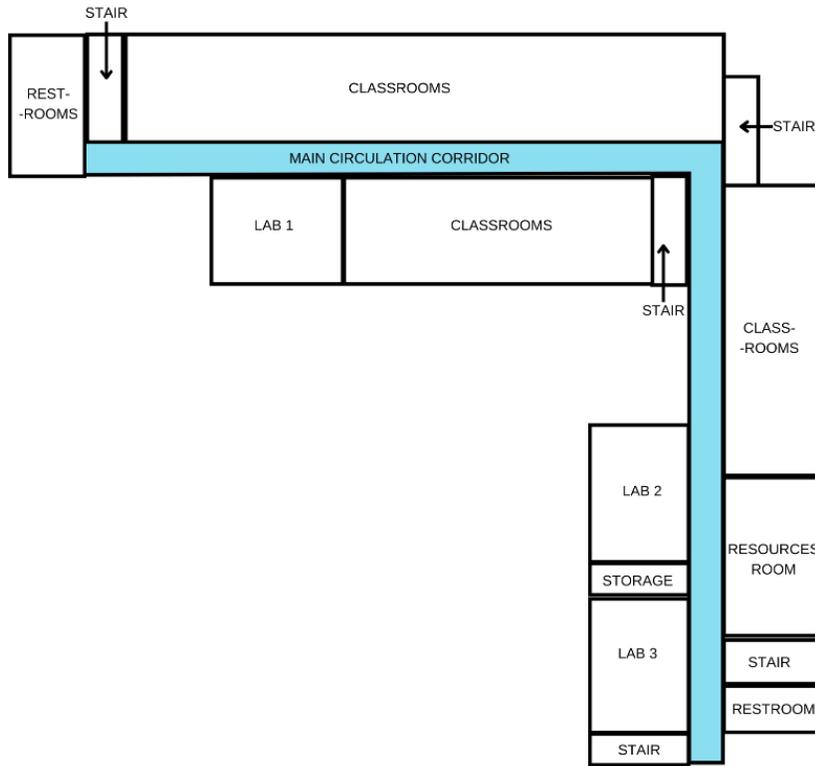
Egyptian Japanese School Building Layout Graphical Representation – Typical Floor (By: Author)
